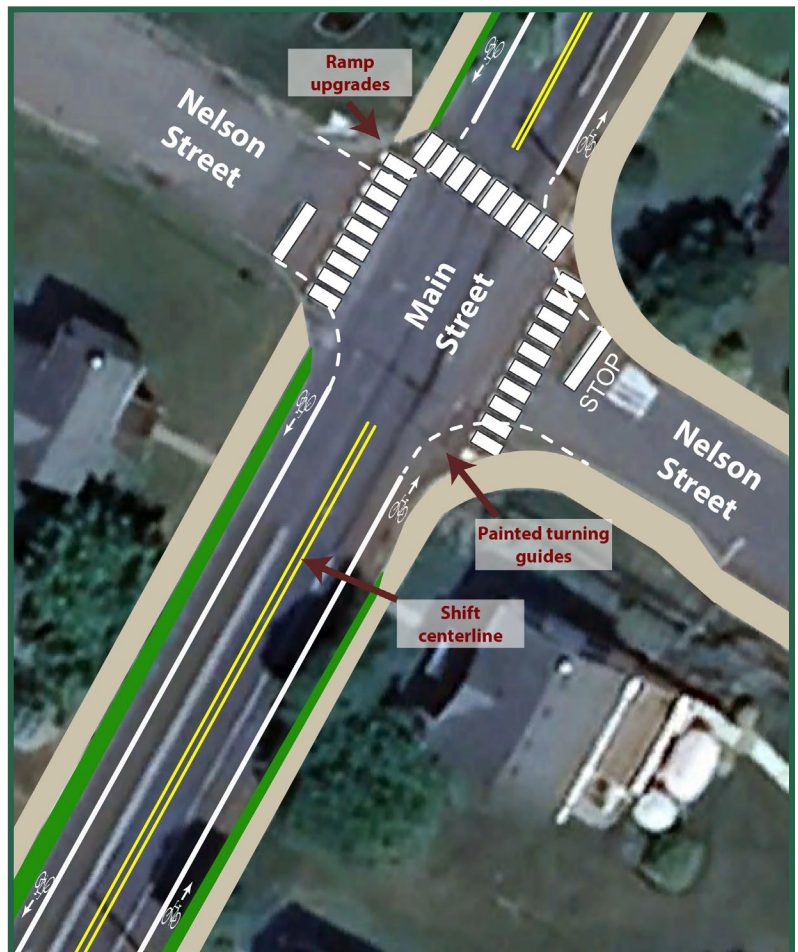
Whitehouse Avenue to Nelson Avenue Recommendations.
